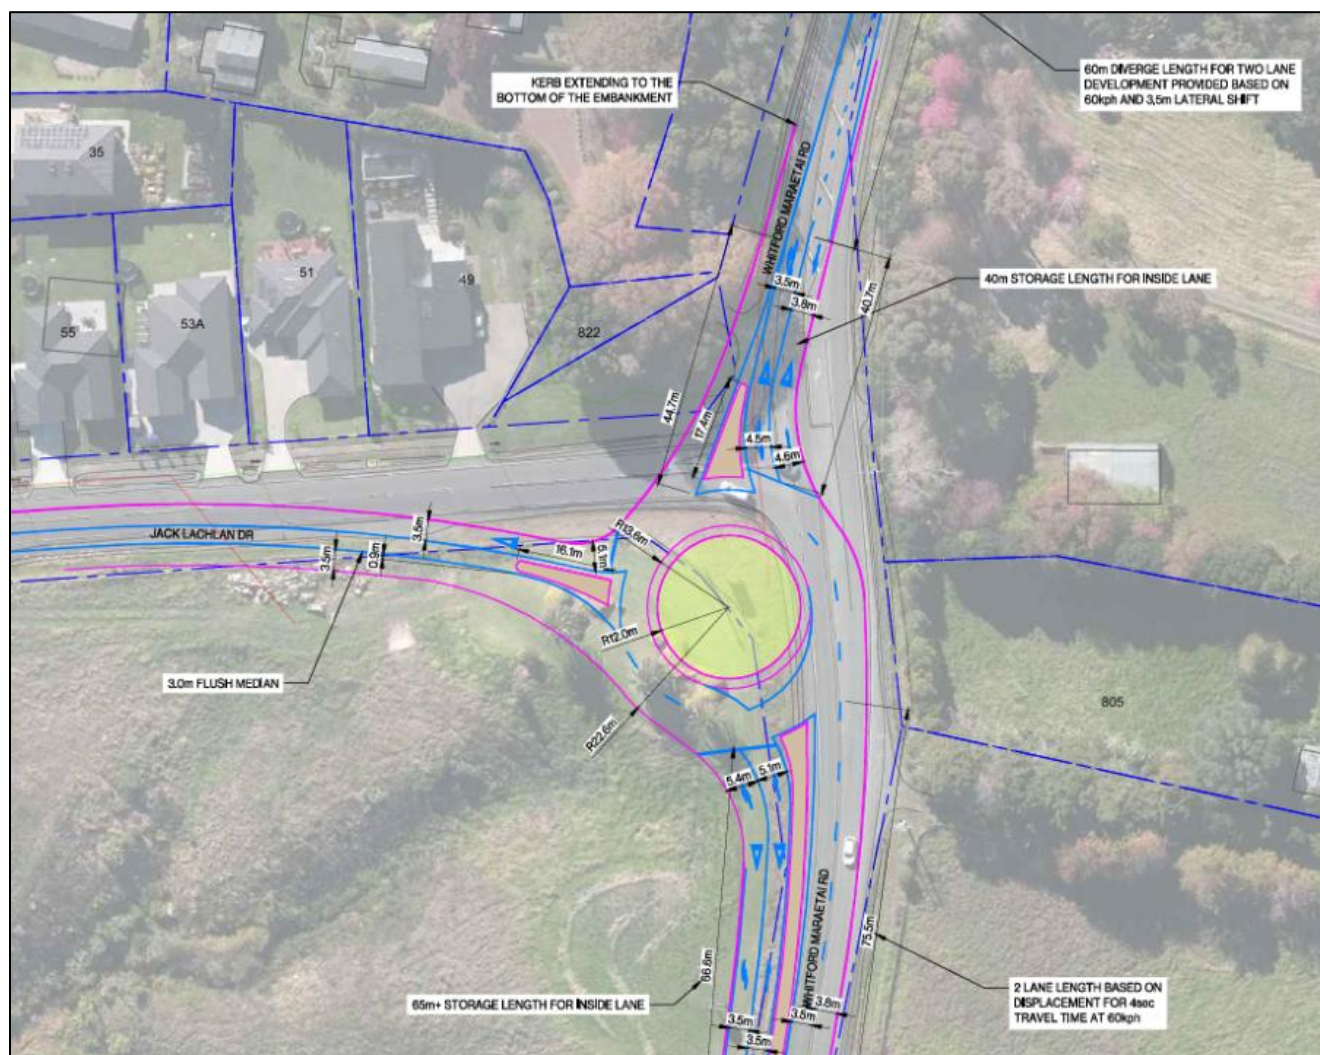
Jack Lachlan Drive / Whitford - Maraetai Road Roundabout Upgrade
